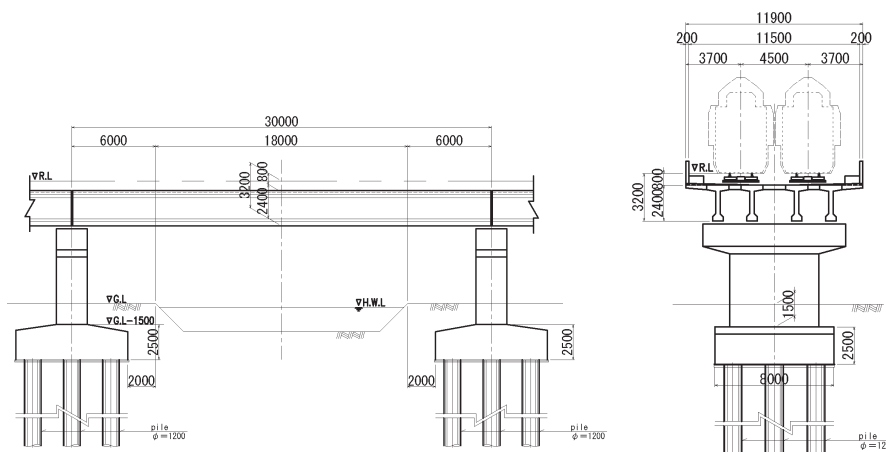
Bridge (PC I-shaped Girder) (L=30m)
